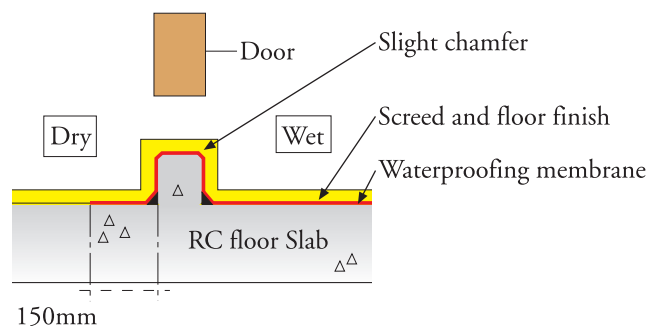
Typical floor slab with waterproofing membrane and finishes
